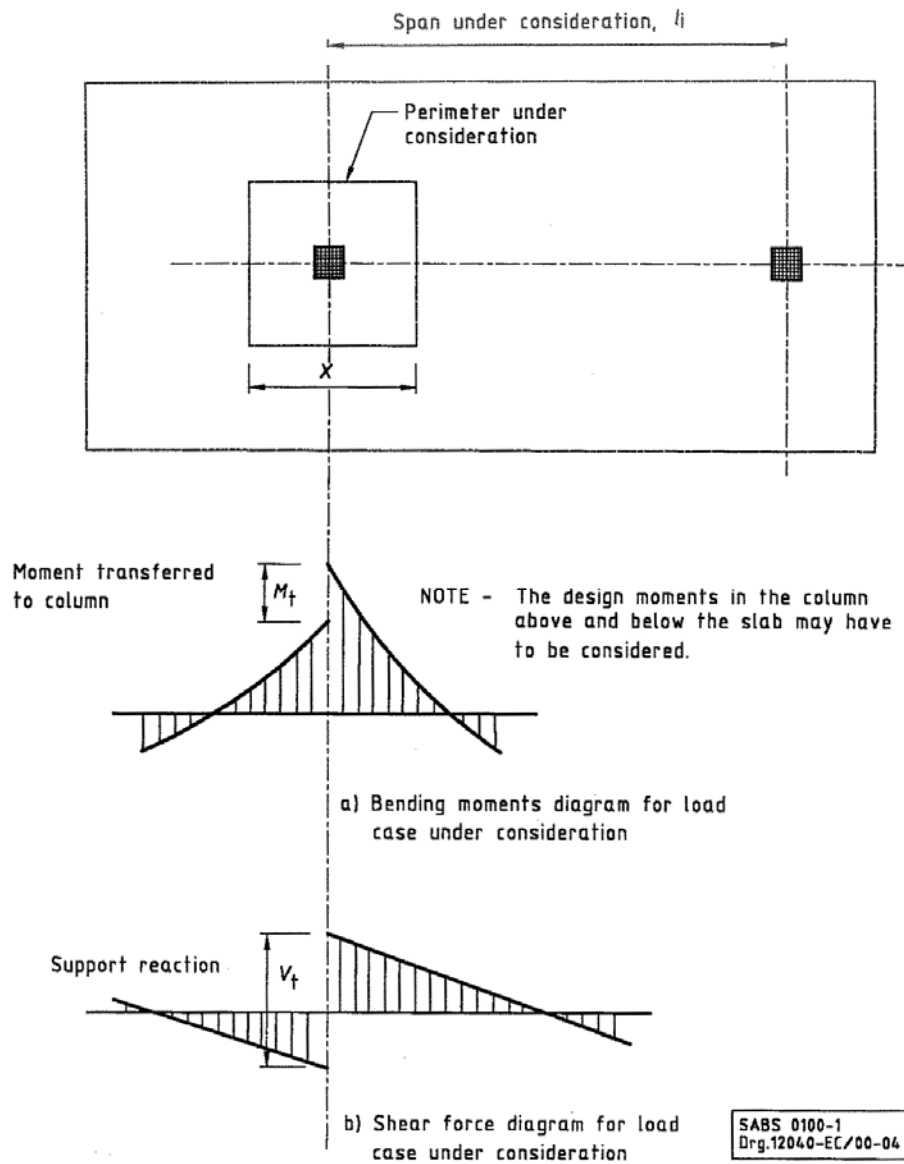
Shear at slab internal column connection – SANS 10100
